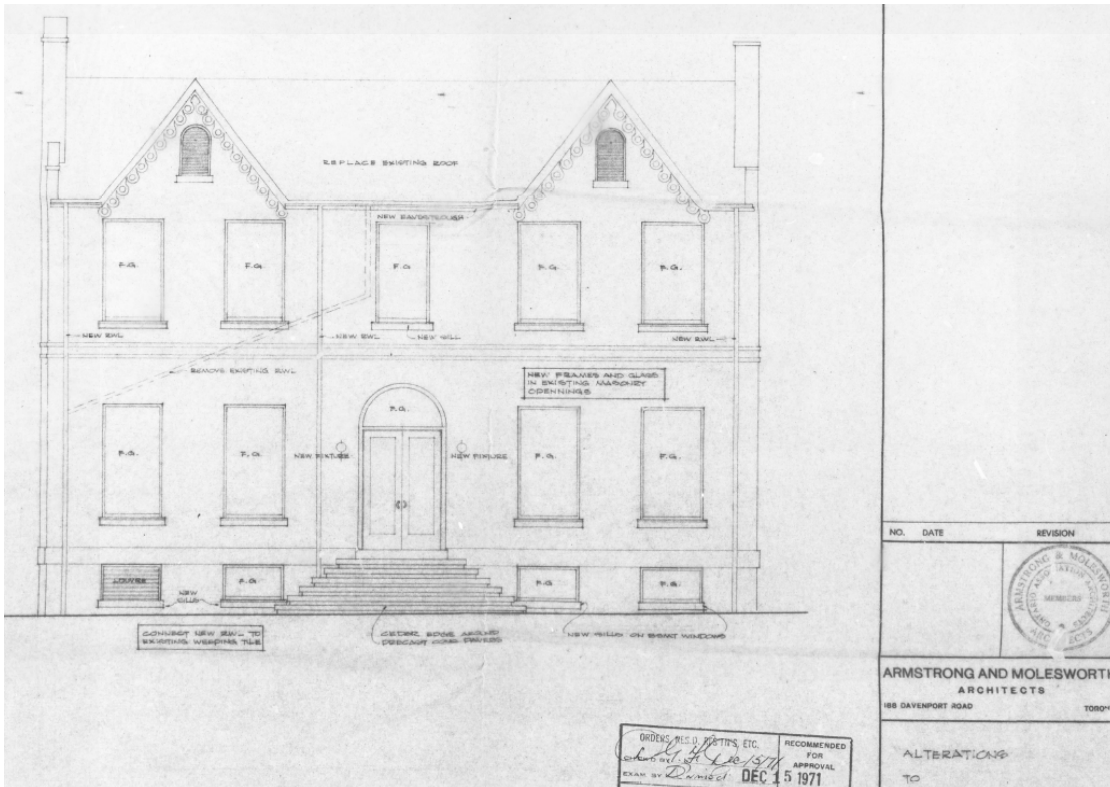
1971 elevation drawing by Armstrong & Molesworth showing addition of front stair at 115 Berkeley Street (Building Records)
